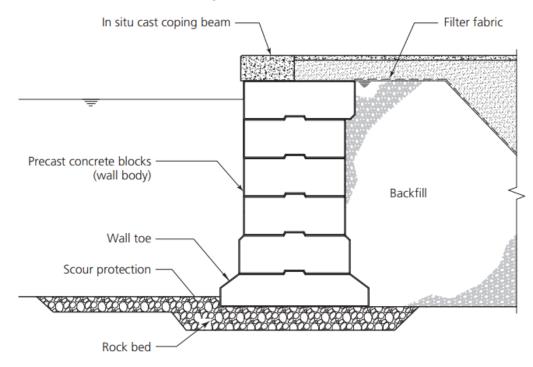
Typical cross-section of a gravity block wall (Ackhurst, 2020)
